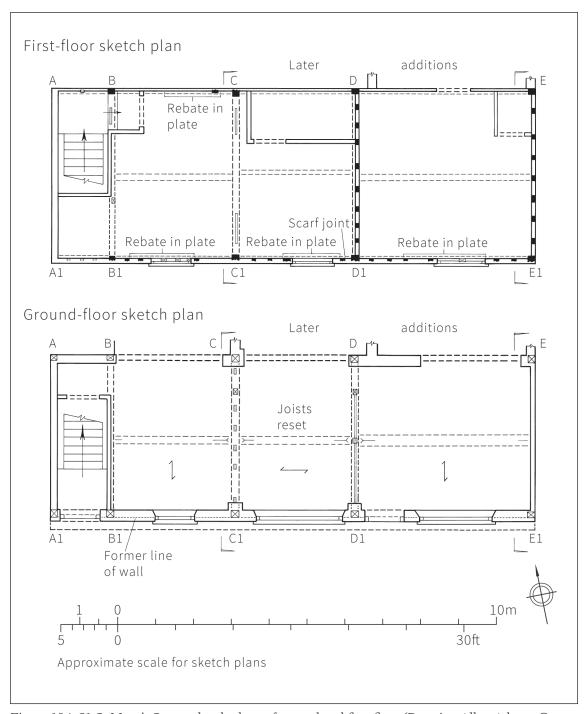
81 St Mary's Street, sketch plans of ground and first floor (Drawing Allan Adams © Historic England).
